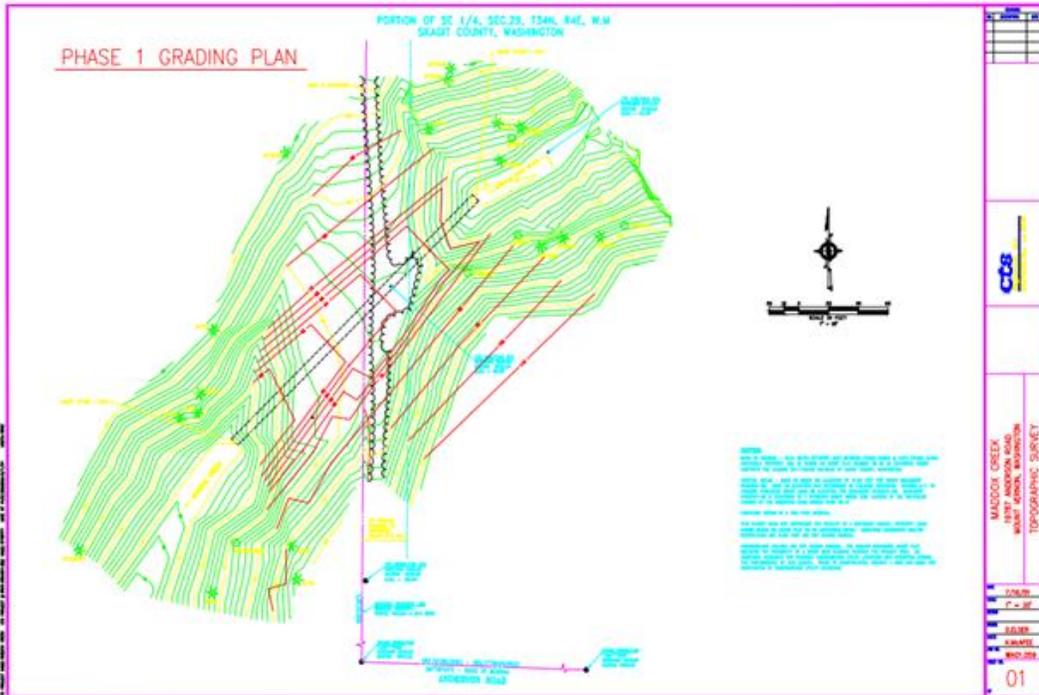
Phase one for excavation and removal of the Maddox Creek culvert. CTS Engineers Inc. created these plans.
